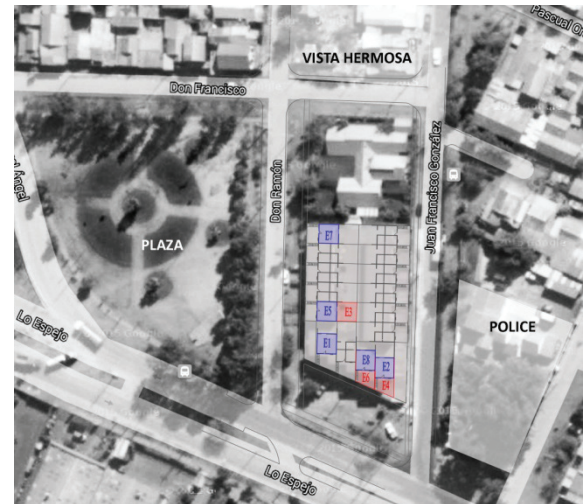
Elemental Lo Espejo site plan, eight houses of participants: first floor houses (red), duplex houses - second and third floor (blue)
